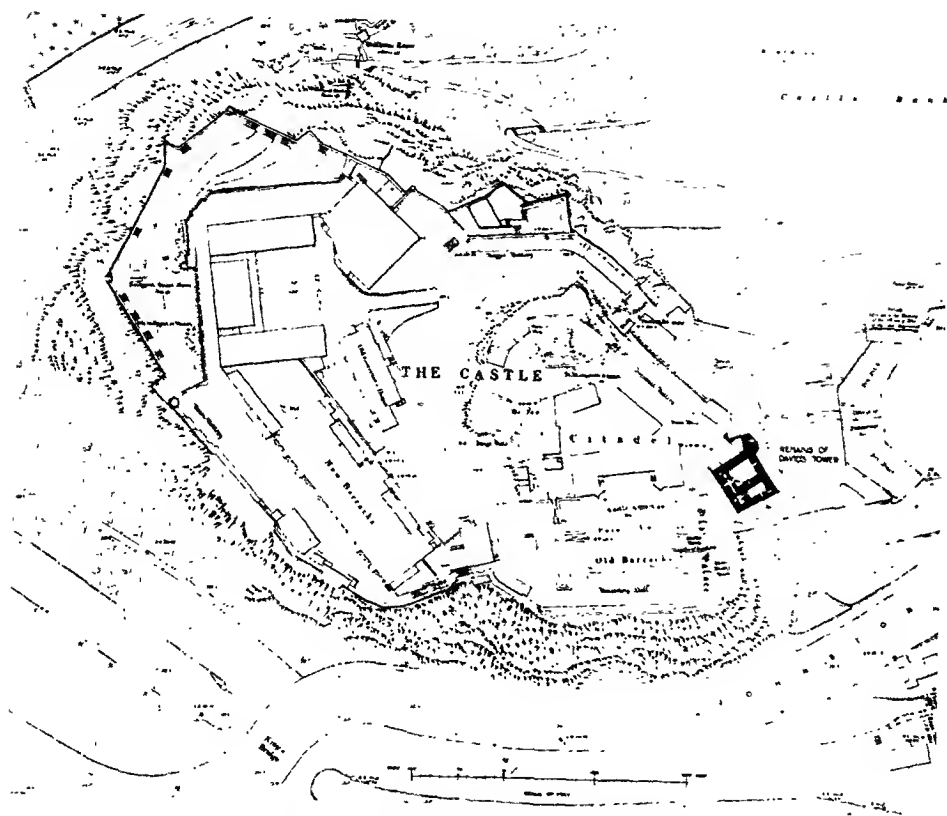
Key Plan of the Castle, showing the position of David's Tower.
